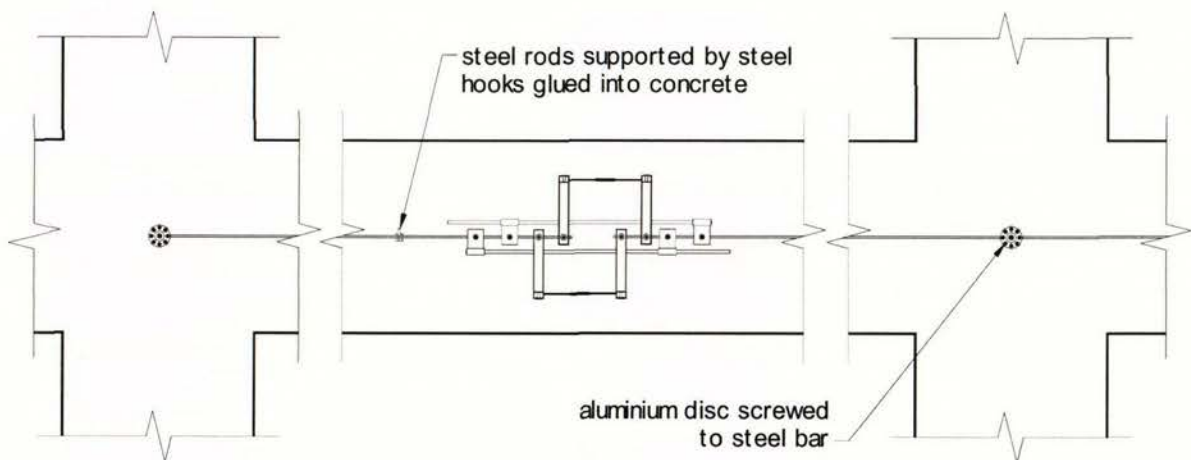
Instrumentation to measure direct elongation of beam between beam-column joints.
